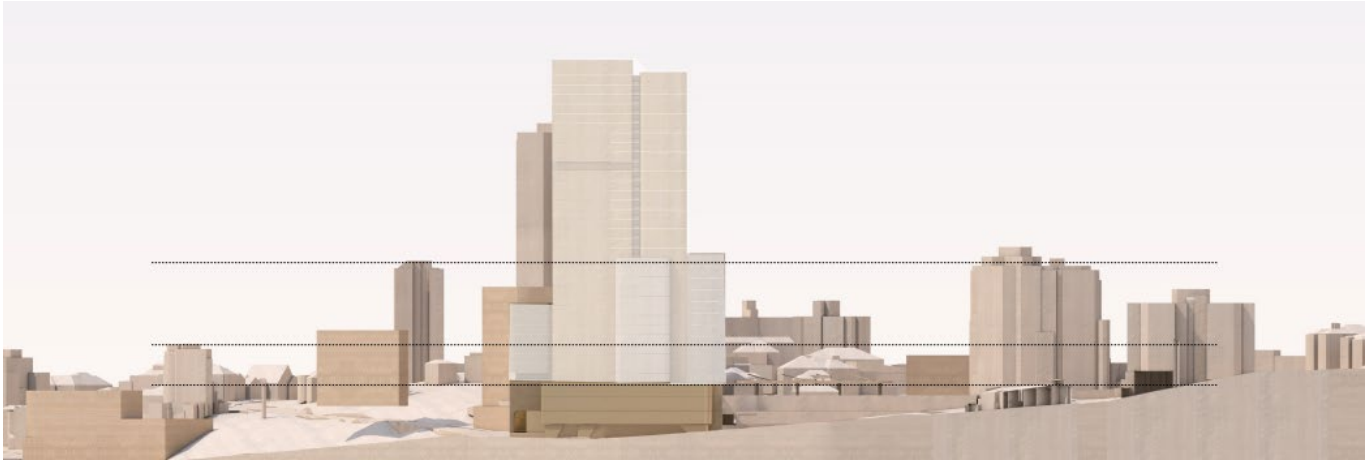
Existing Streetscape along New McLean Street (South)
